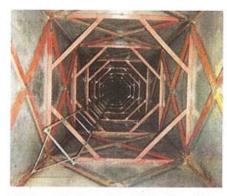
The internal ladder for foundation anchor bolts and lightning rod attachment.
